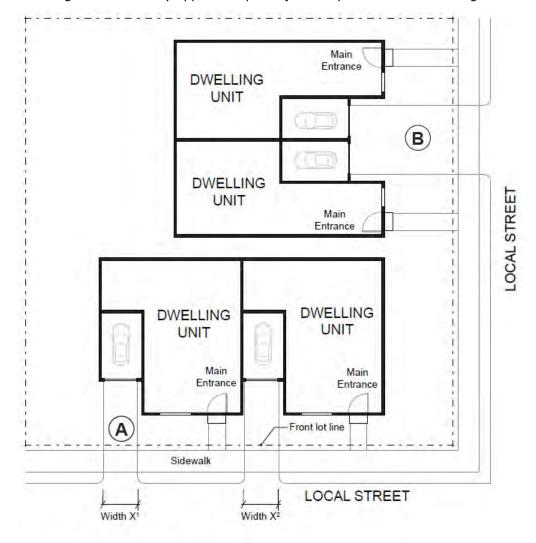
Driveway Approach Options for Multiple Local Street Frontages
